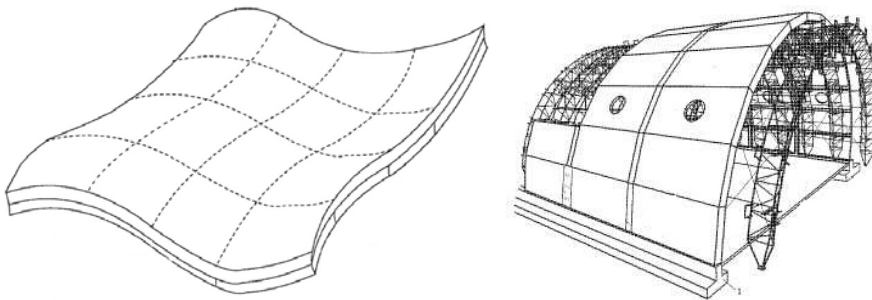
Products that could be produced by a flexible mould. Left: concrete elements used as lost formwork for a plank floor (Nachbauer, 2012), right: tunnel liners (Milinkovic, 2010) (Espacenet)
